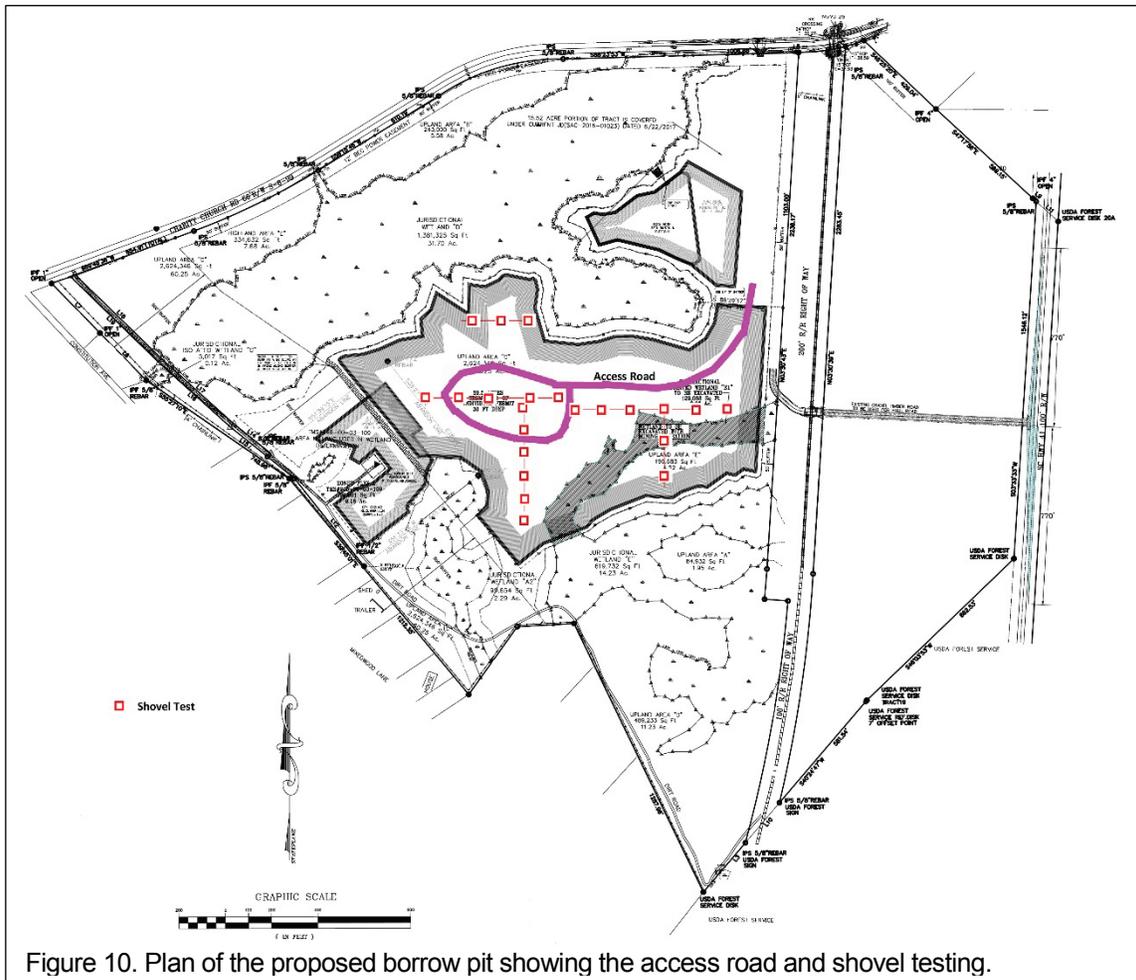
Plan of the proposed borrow pit showing the access road and shovel testing.
